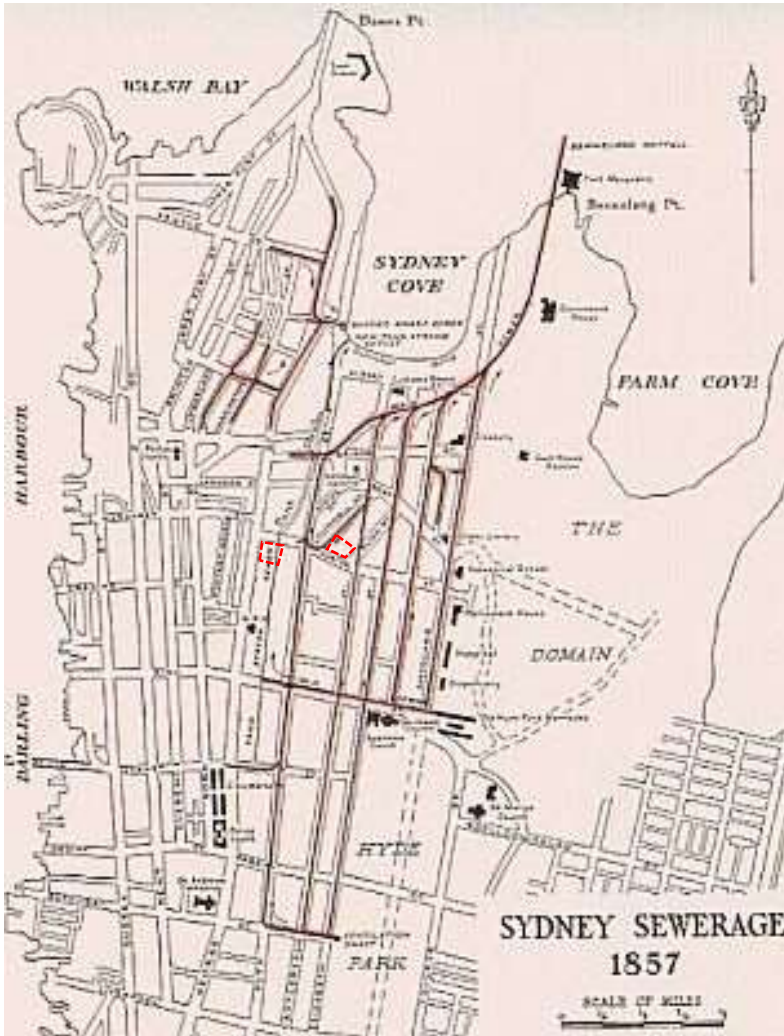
Bannelong Sewers - Historical Plan, with indicative site boundaries shown dotted red. Source: Aird, WV.
